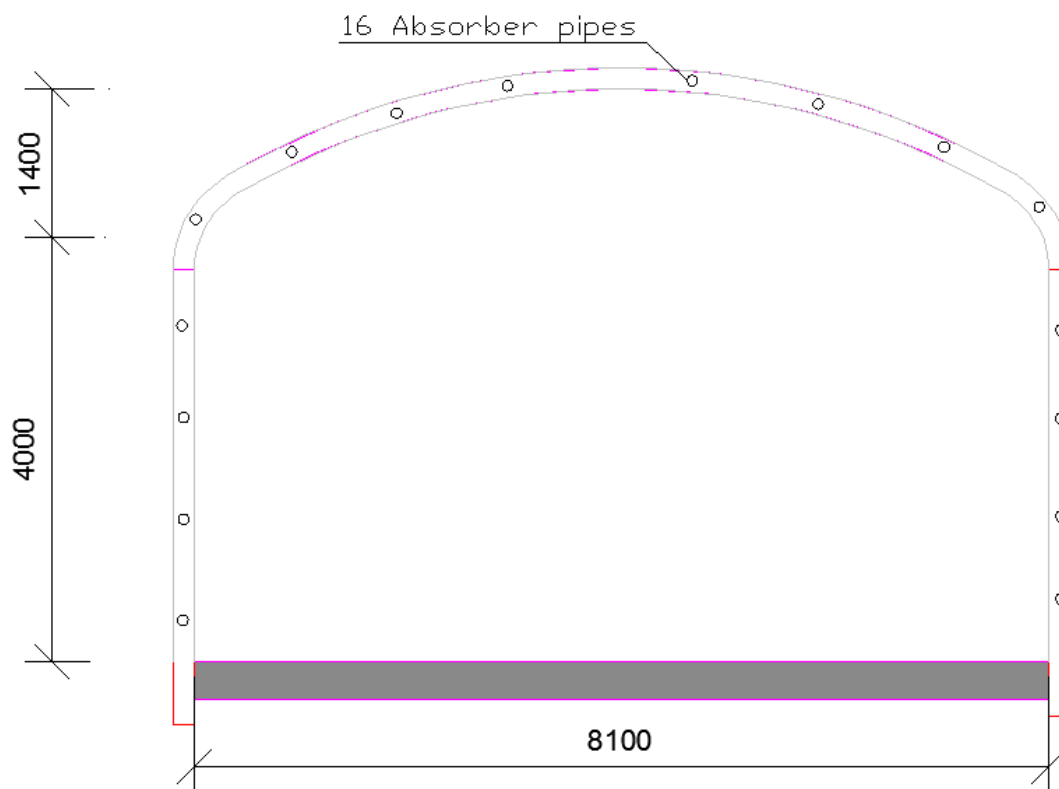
Cross-section of the service tunnel shows how the tunnel lining pipes could be installed in the service tunnel at Helsinki city rail loop. Original picture from Granlund Oy then modified by Niklas Wiik.
